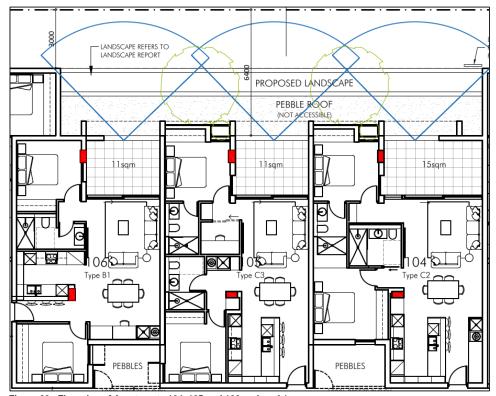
Floorplan of Apartments 104, 105 and 106 on Level 1
